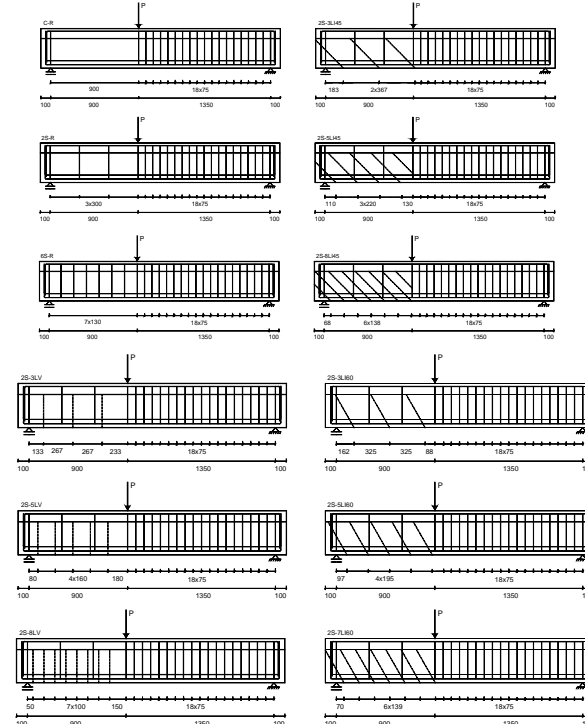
Tested beams: localization of the steel stirrups (thick line) and CFRP laminates (dashed line).
